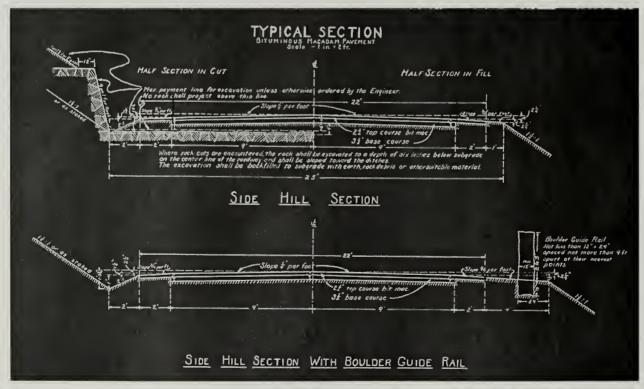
Cross-section diagram for Cadillac Mountain Road, 1931, showing a 22-foot cross-section that includes an 18-foot traveled way, 2-foot shoulder in cut, and 3-foot shoulder in fill (4 feet if guardwall present). (U.S. Department of Agriculture, Bureau of Public Roads, Project 1, Sheet 4 of 11, 1931)
